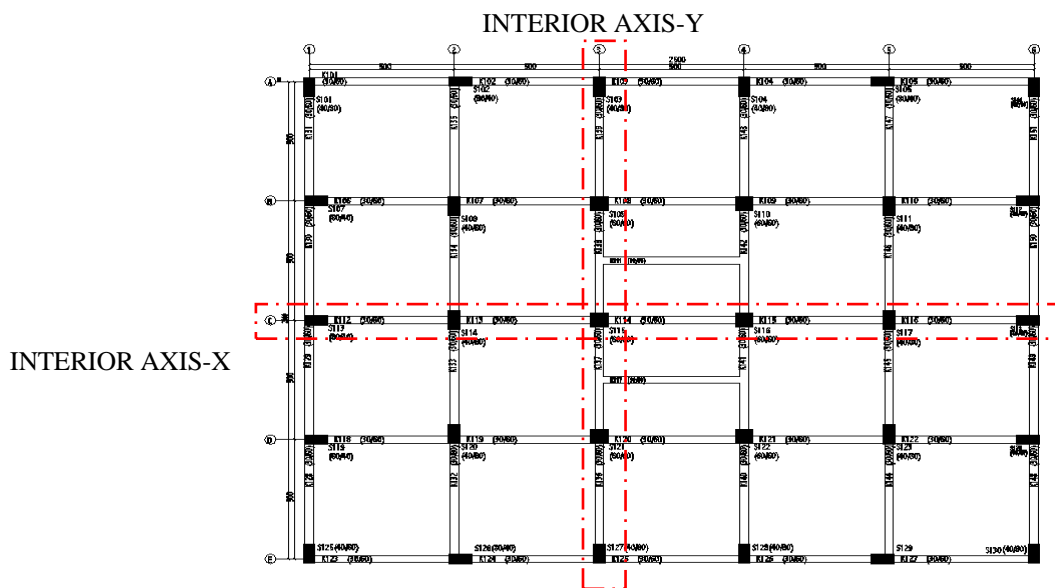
Plan view of the considered buildings (Selected frame models are also marked.)
